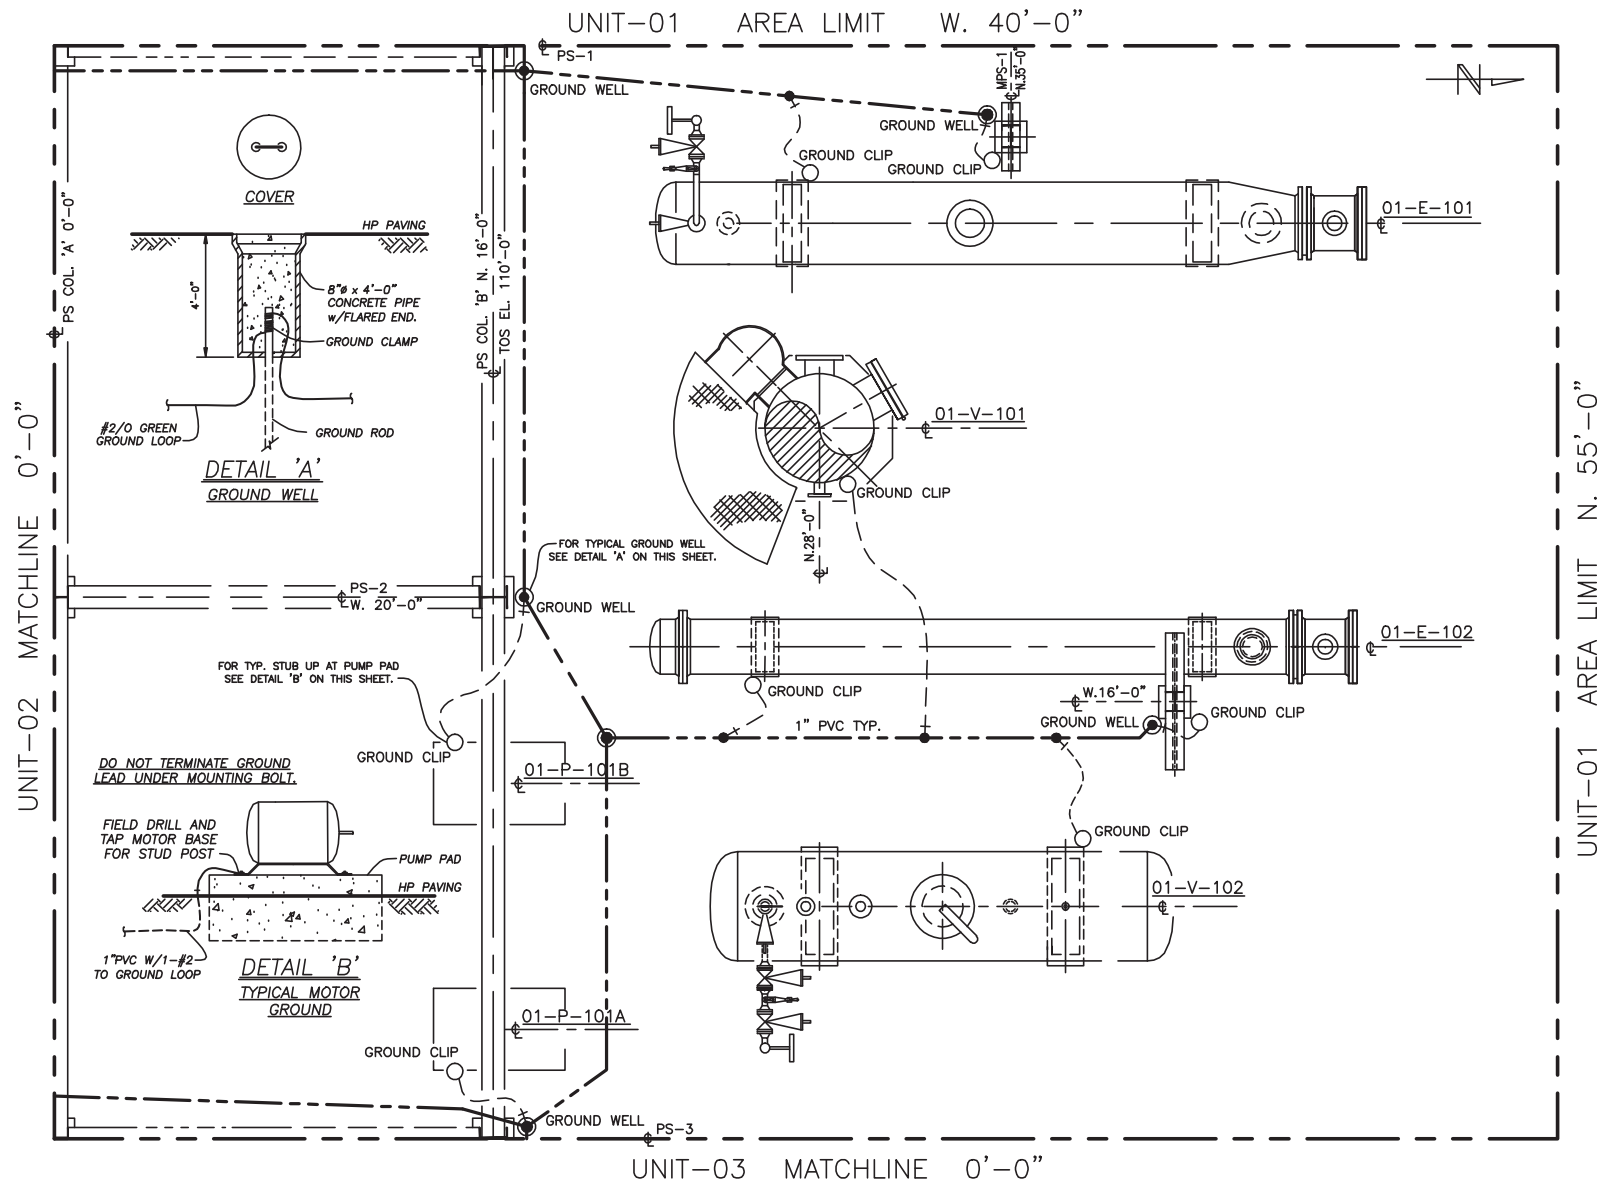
Unit-01: Electrical: Grounding Plan.
